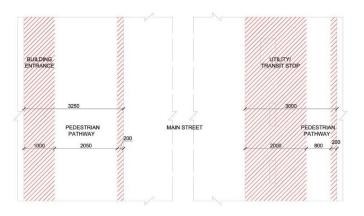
Street width and buffer spaces (in mm) for Gateway 5 in the area surrounding Frankfurt am Main Hauptbahnhof
